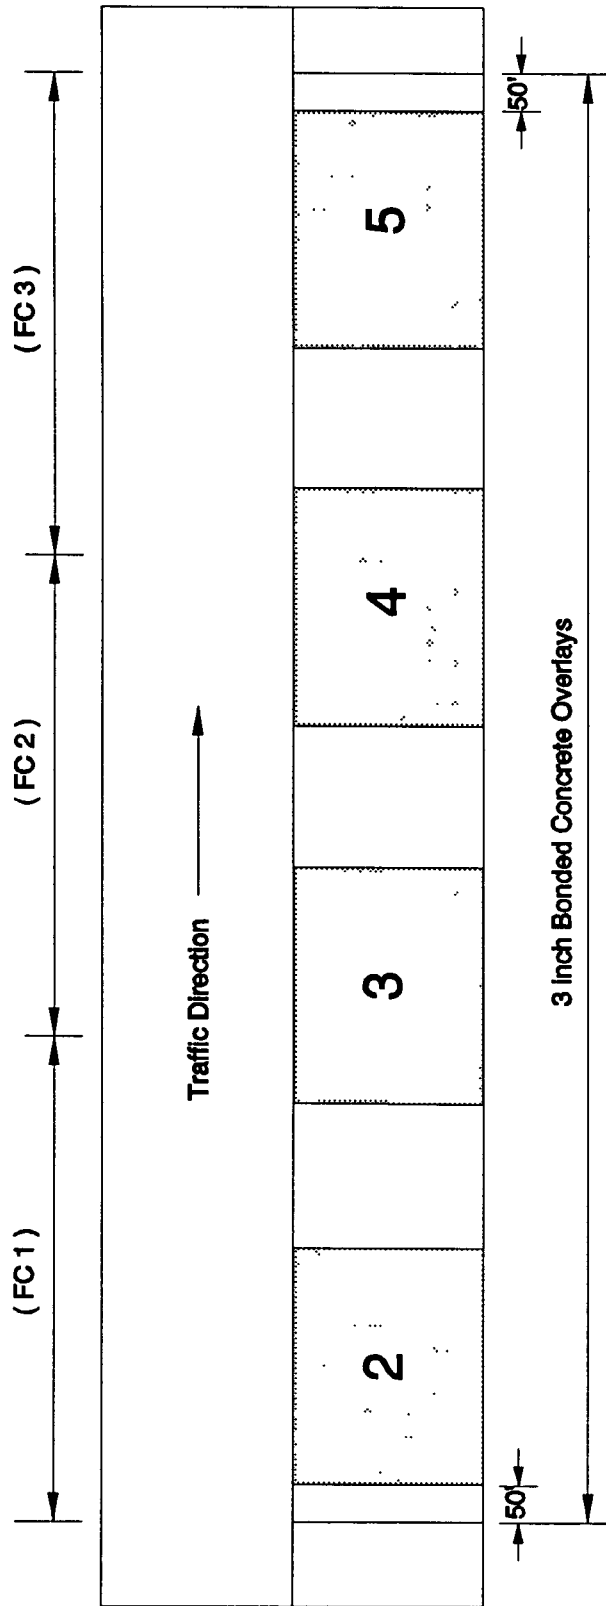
Example of "Pre-Construction" Sampling Plan for Test Section 9
